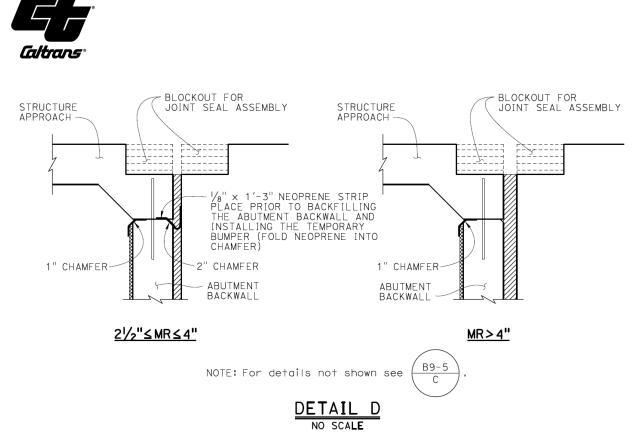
Joint Seal Protection Detail (MR > 21/2")
